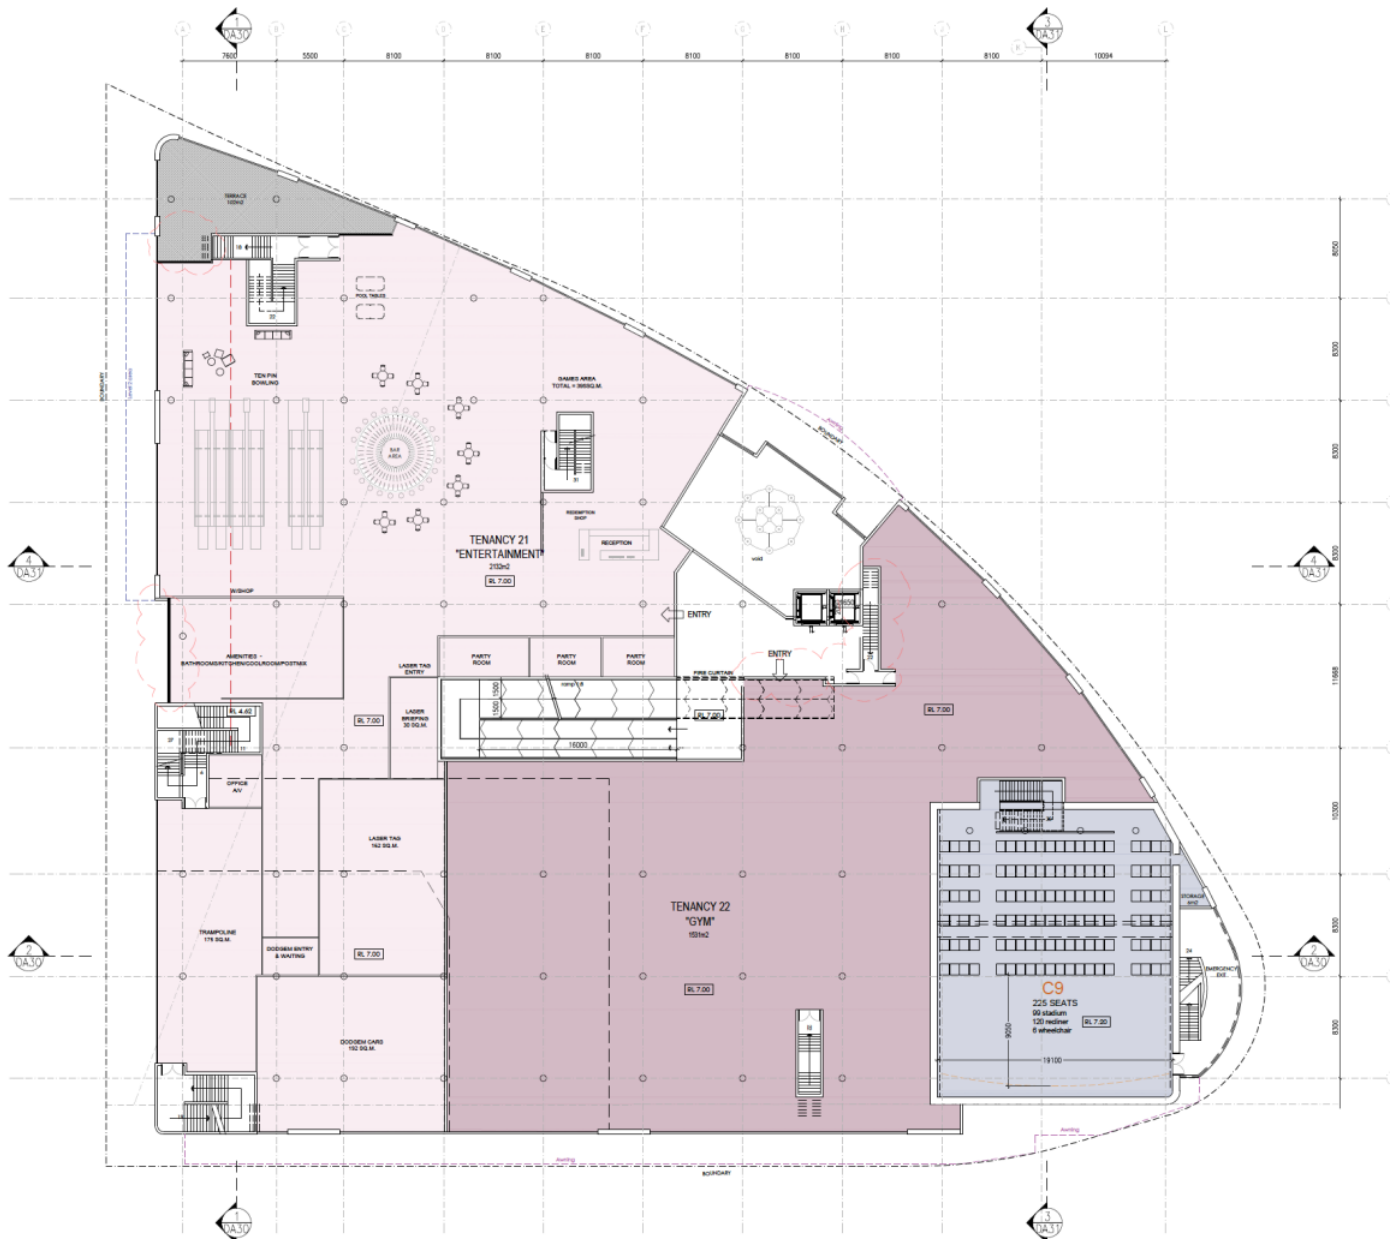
Amended First floor of proposed commercial and entertainment complex, showing gym and entertainment tenancies
